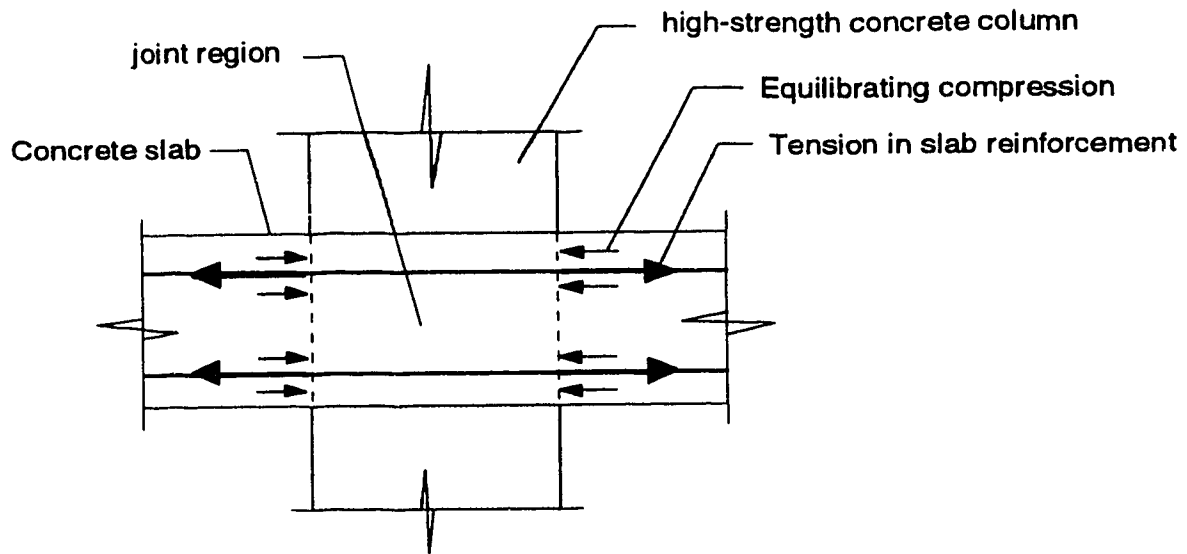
Stresses at joint region (specimens with unloaded slabs)
